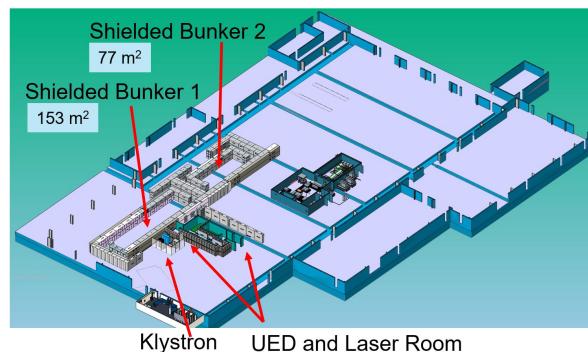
A floor plan of the LEAD facility, showing the two shielded bunkers and the existing UED beamline.
